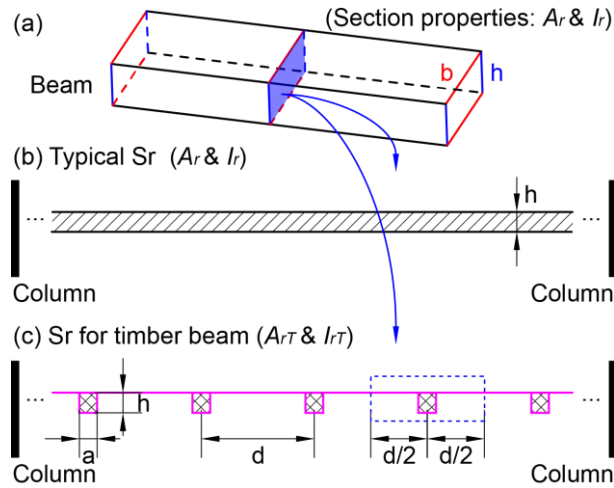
The rectangular cross section for a beam: (a) the cross section in a beam; (b) the typical rectangular cross section between two columns, used for the reinforce concrete buildings; (c) the special rectangular cross section between two columns, used for the unreinforced masonry buildings (ex. The 1st floor) with the marital of timber
